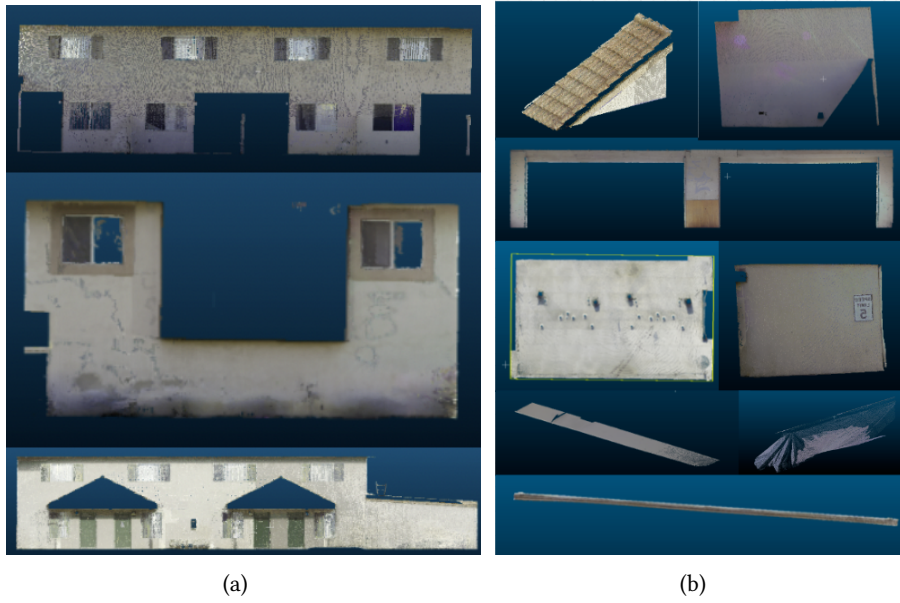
Example of segmented facades for Corona building 205 showing (a) well formed facades (b) "junk" facades
